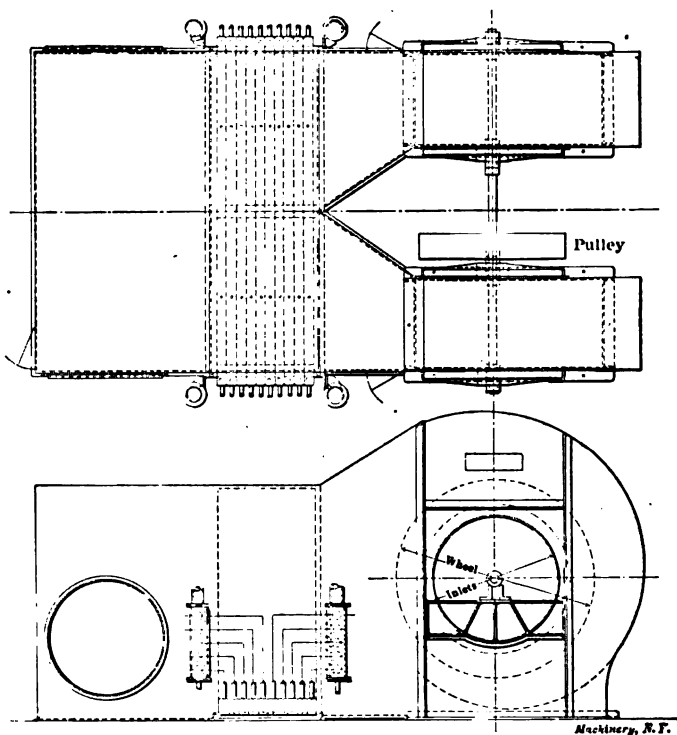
Fan and Heater of Installation shown in Fig. 30
